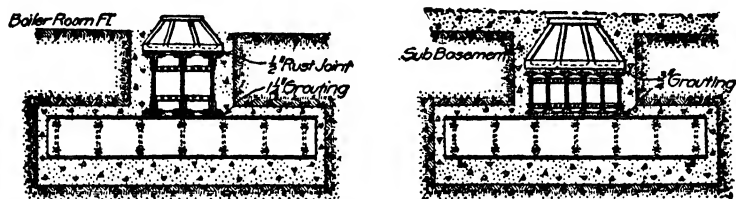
Footings with Plate Girders and I-beams in Double Tiers.
